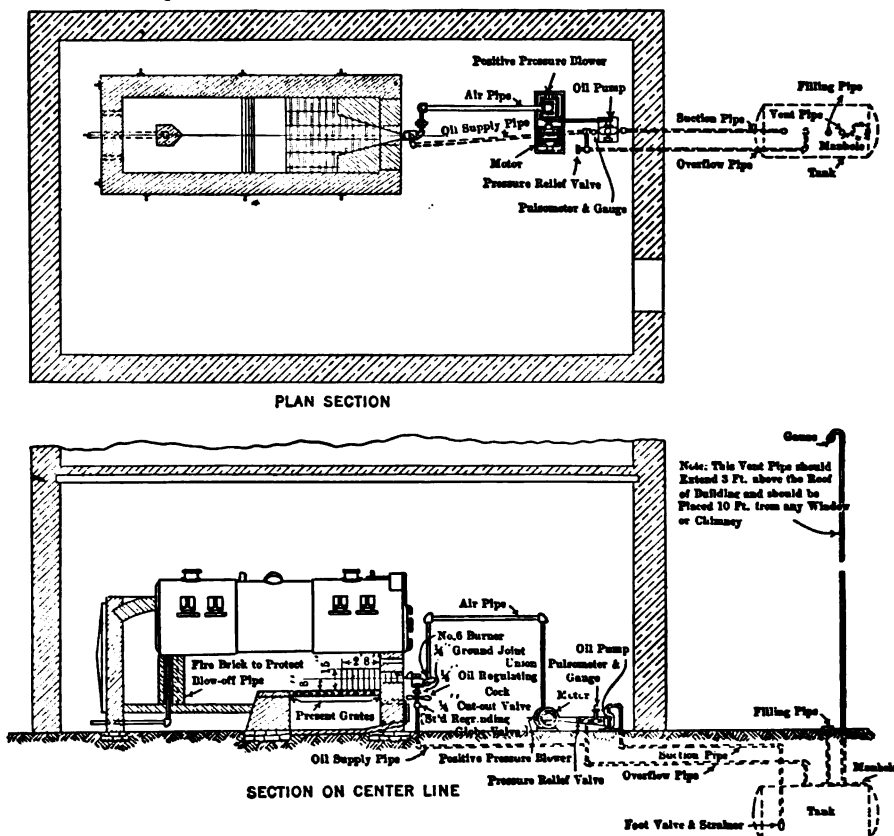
Complete hot water or low-pressure steam boiler equipment.
